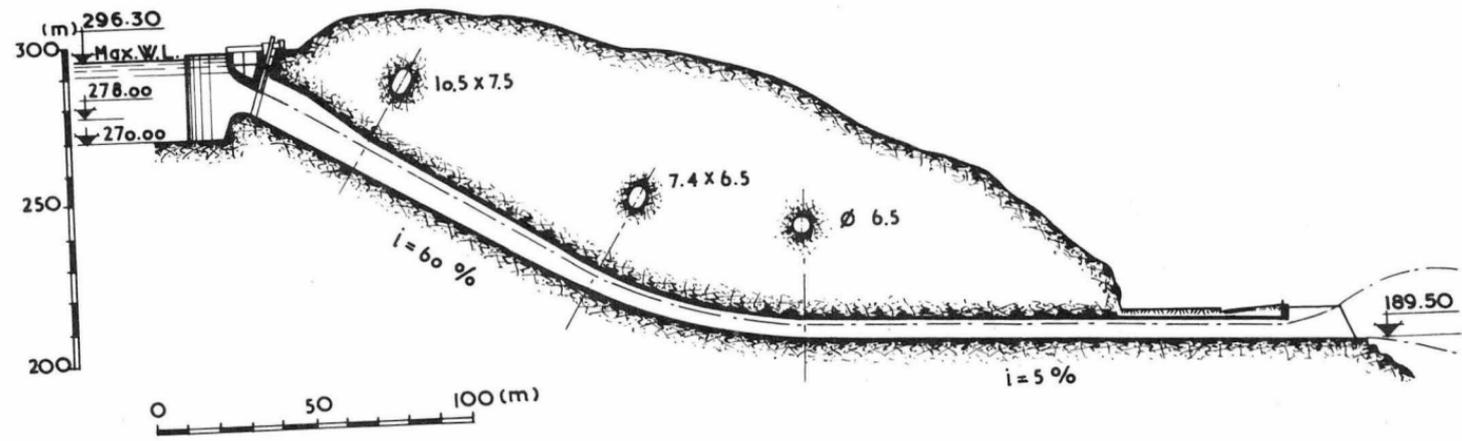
CABRIL — SECTION THROUGH THE SPILLWAY TUNNEL
